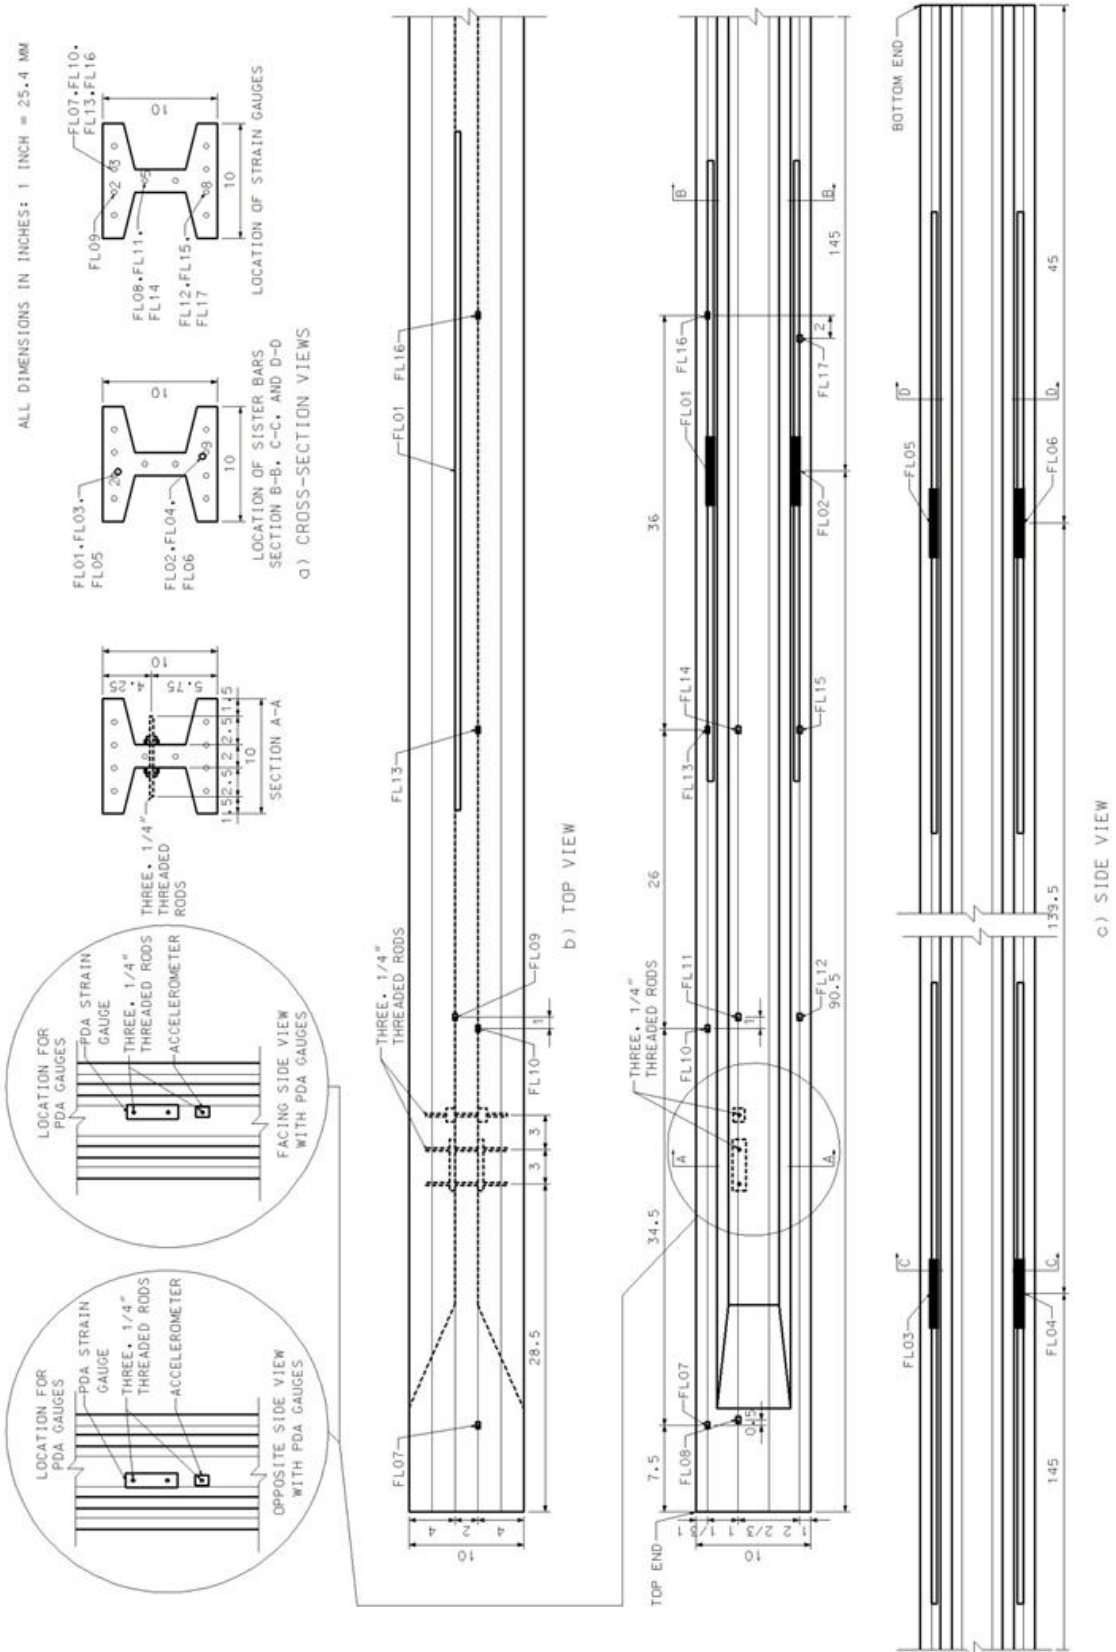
Details of instrumentation used for 35-ft (10.7-m) long UHPC field test pile P1
